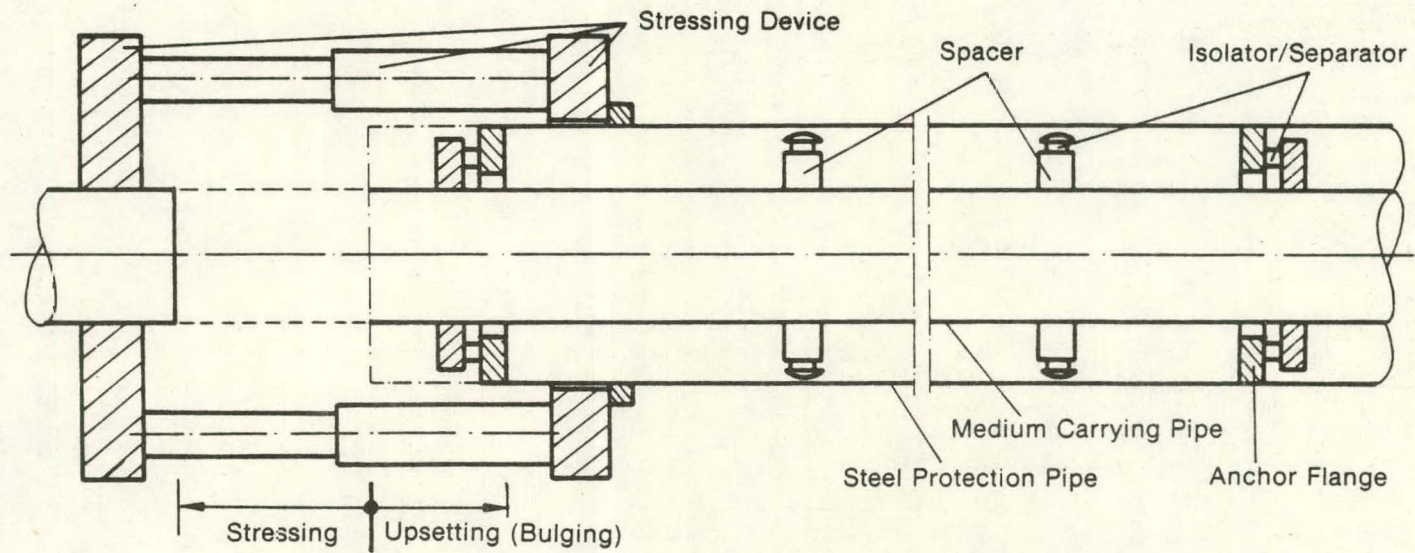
DIAGRAM OF CONDUIT PRESTRESSING
